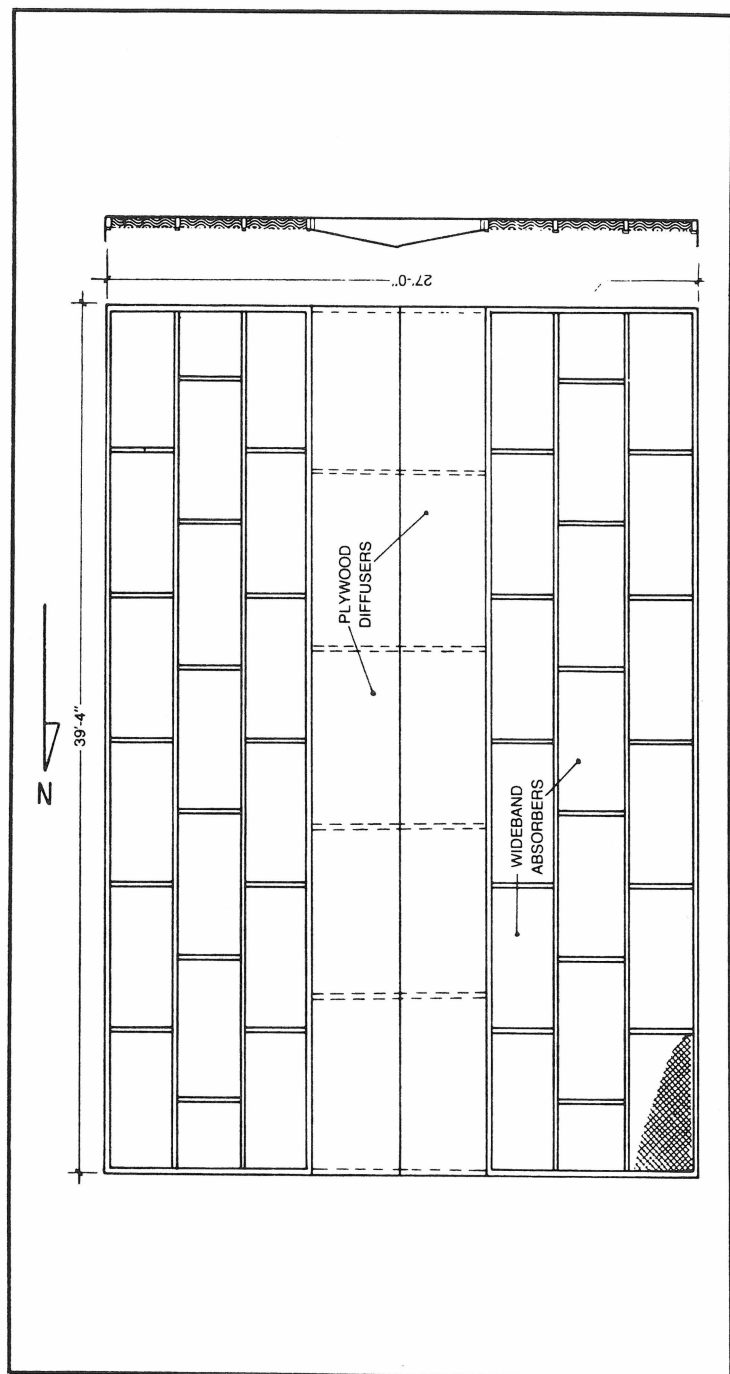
Projected ceiling plan showing ceiling treatment. A triangular cross section plywood element about 8 feet wide runs the full length of the room. The remainder of the ceiling area is covered with 4 inches of 703 wideband sections.
